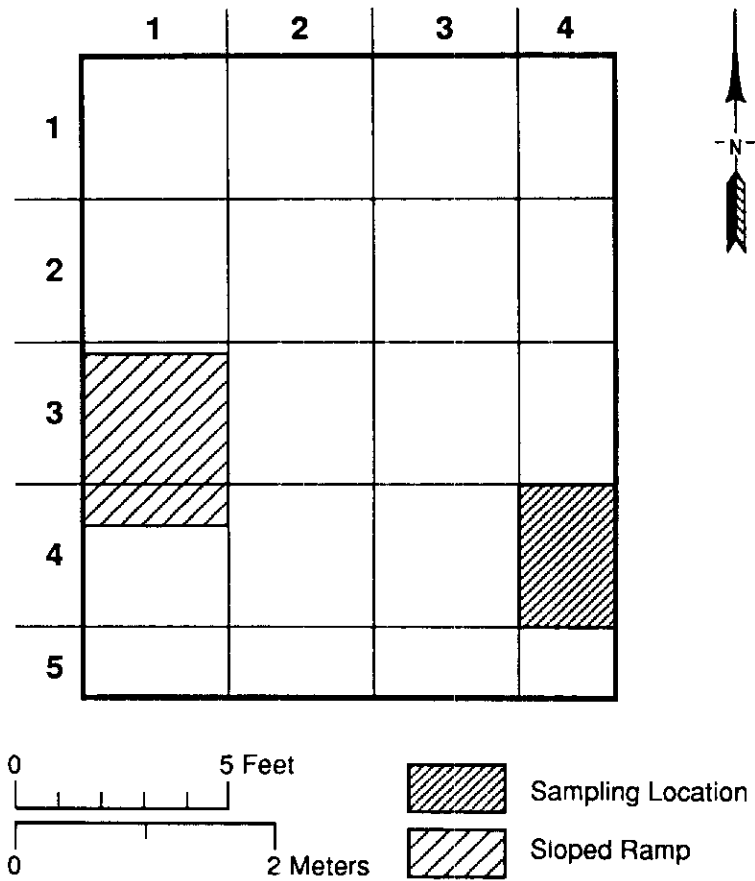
304 Concretion Facility, Outside Storage Pad Concrete and Asphalt Core Sampling Locations.
